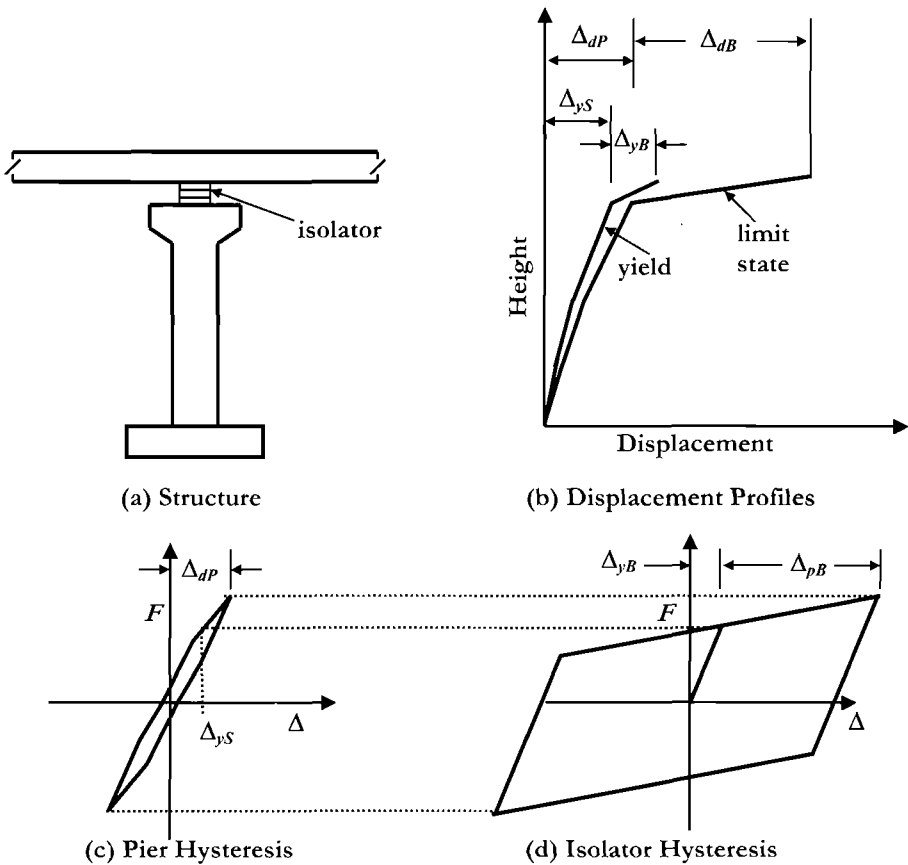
Damping for a Cantilever Pier with an Isolated Deck
